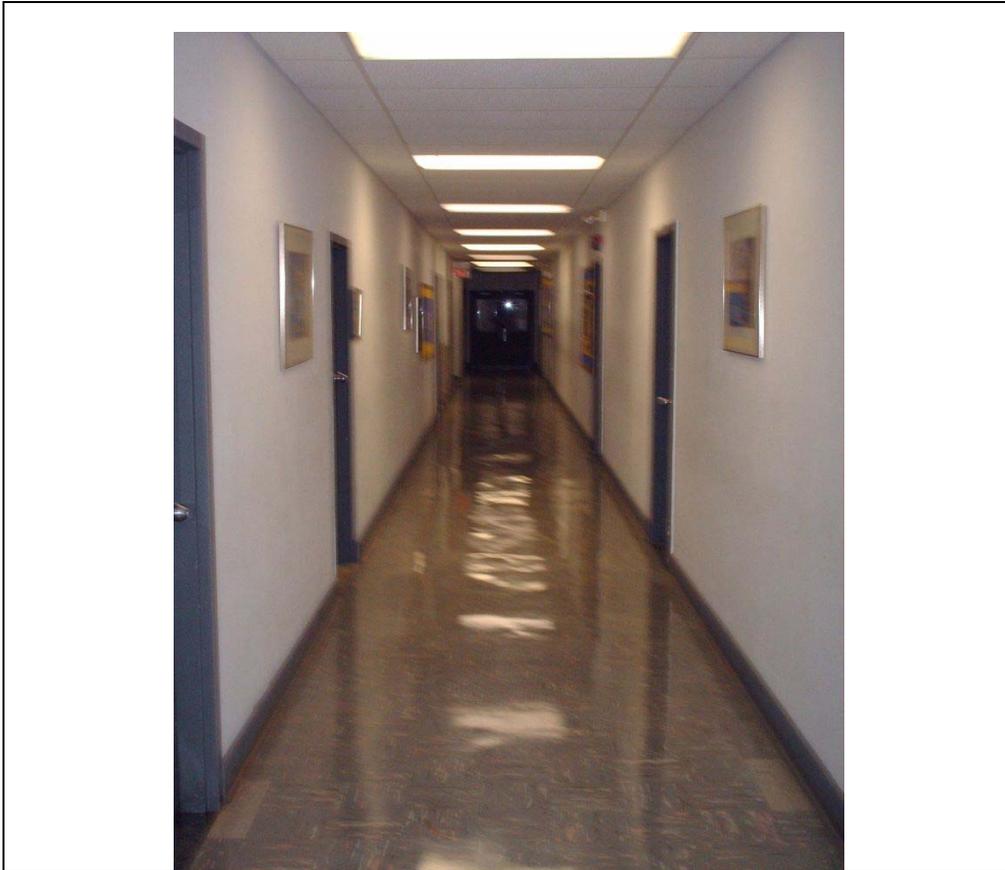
Building 128 – typical hallway. (Source: TtNUS, 11Oct 2006)
